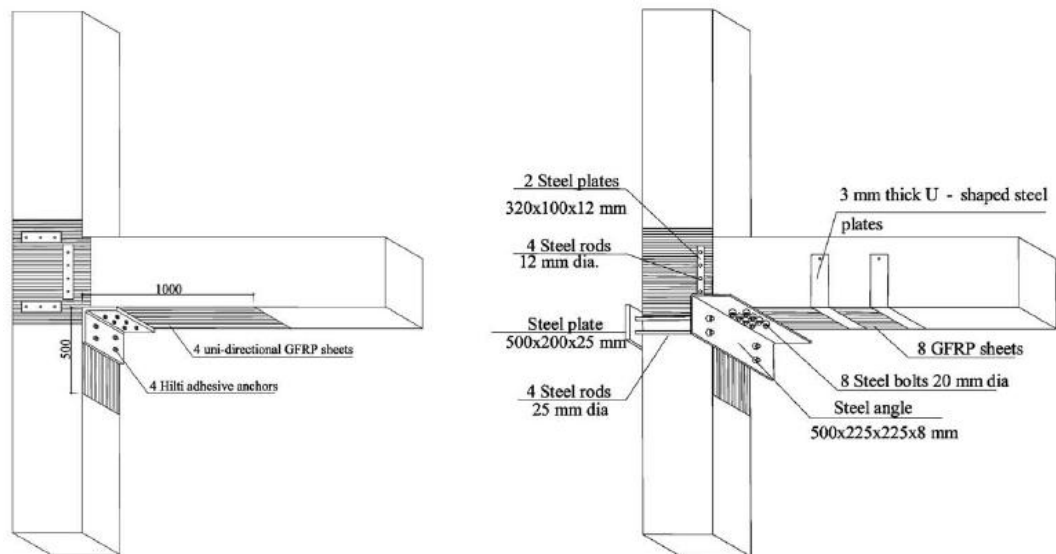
Retrofitting Schemes: (a) Specimen TR1, (b) Specimen TR2 [7]
